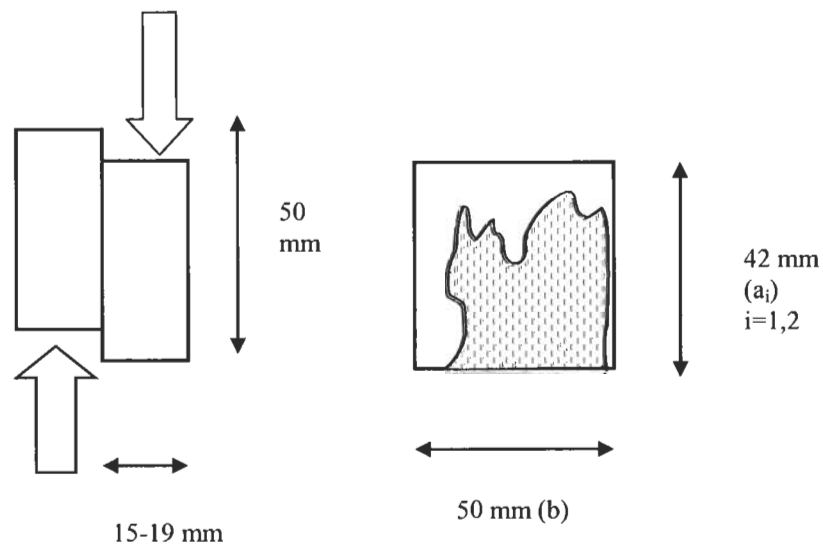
Shear Block Loading (Left Side) and Shear Area (Right Side)
